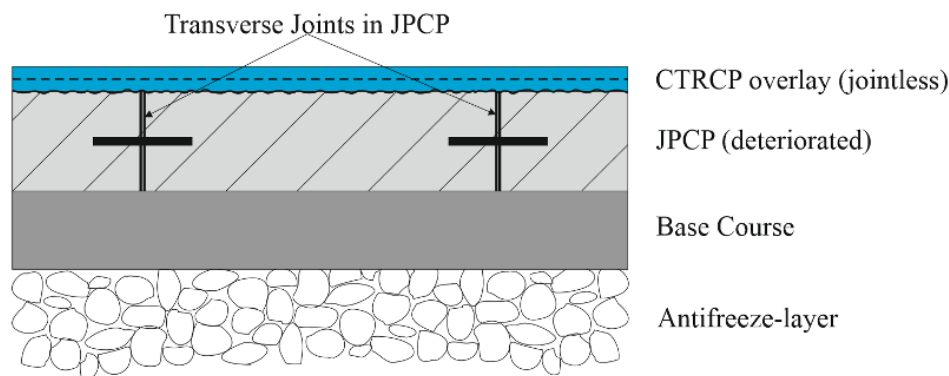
Schematic construction of a jointless Carbon Textile Reinforced Concrete Pavement (CTRCP) overlay on a deteriorated JPCP bottom-layer (jointed).
